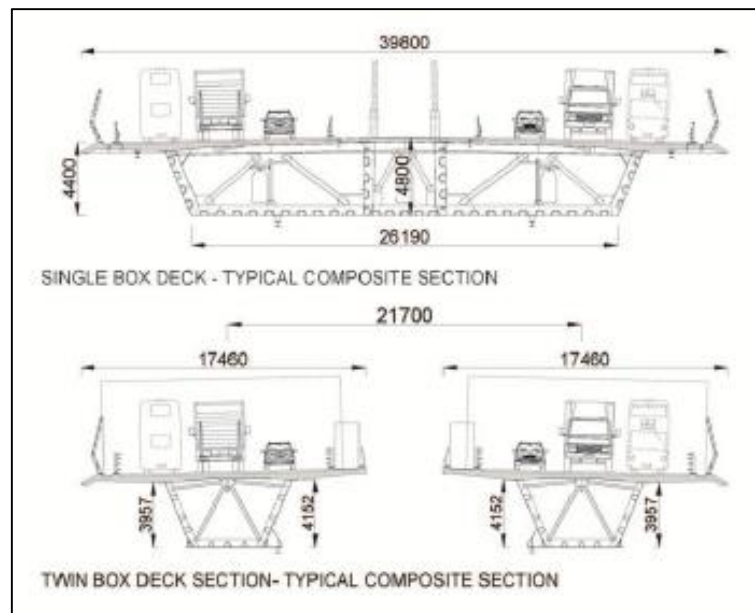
Bridge deck typical sections: single box (above) and twin box (below) composite (Curran, et al., 2018)
